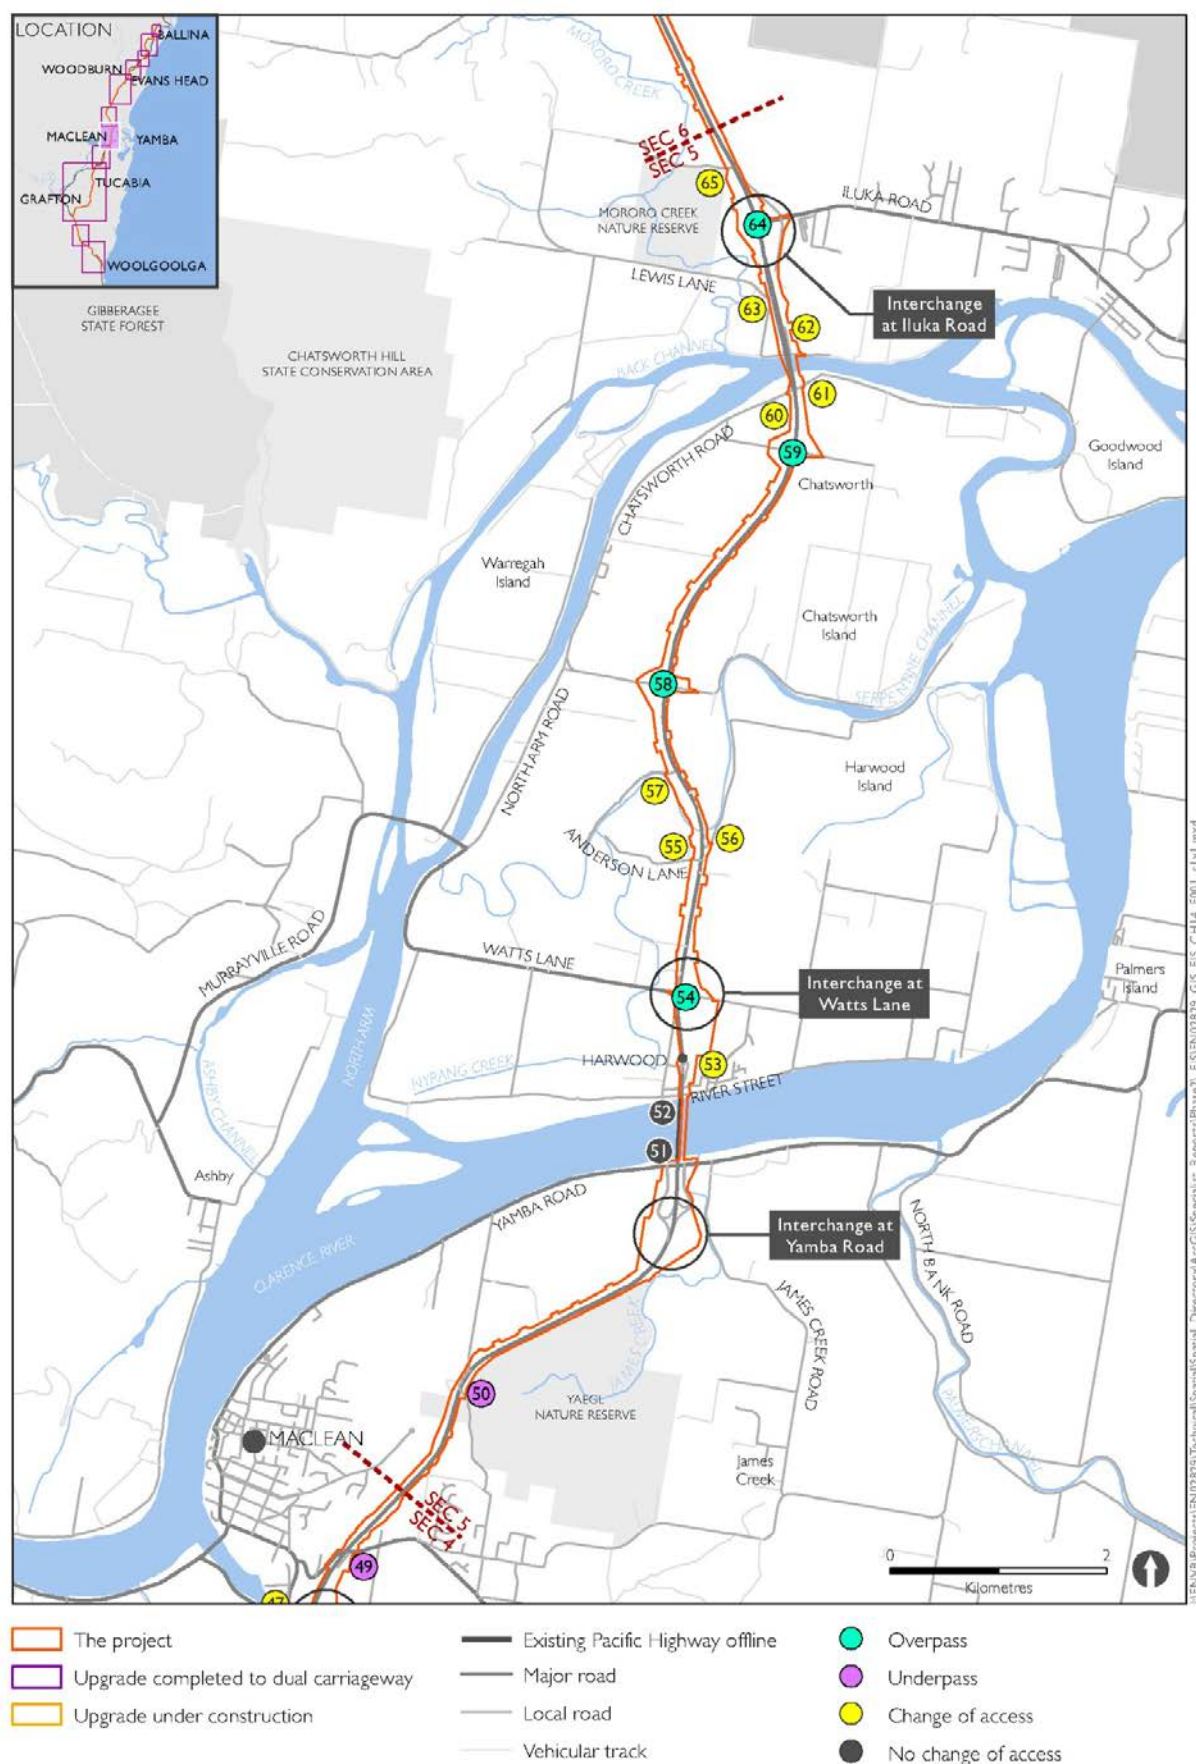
Locations of road alterations or changed access arrangements: Section 5
